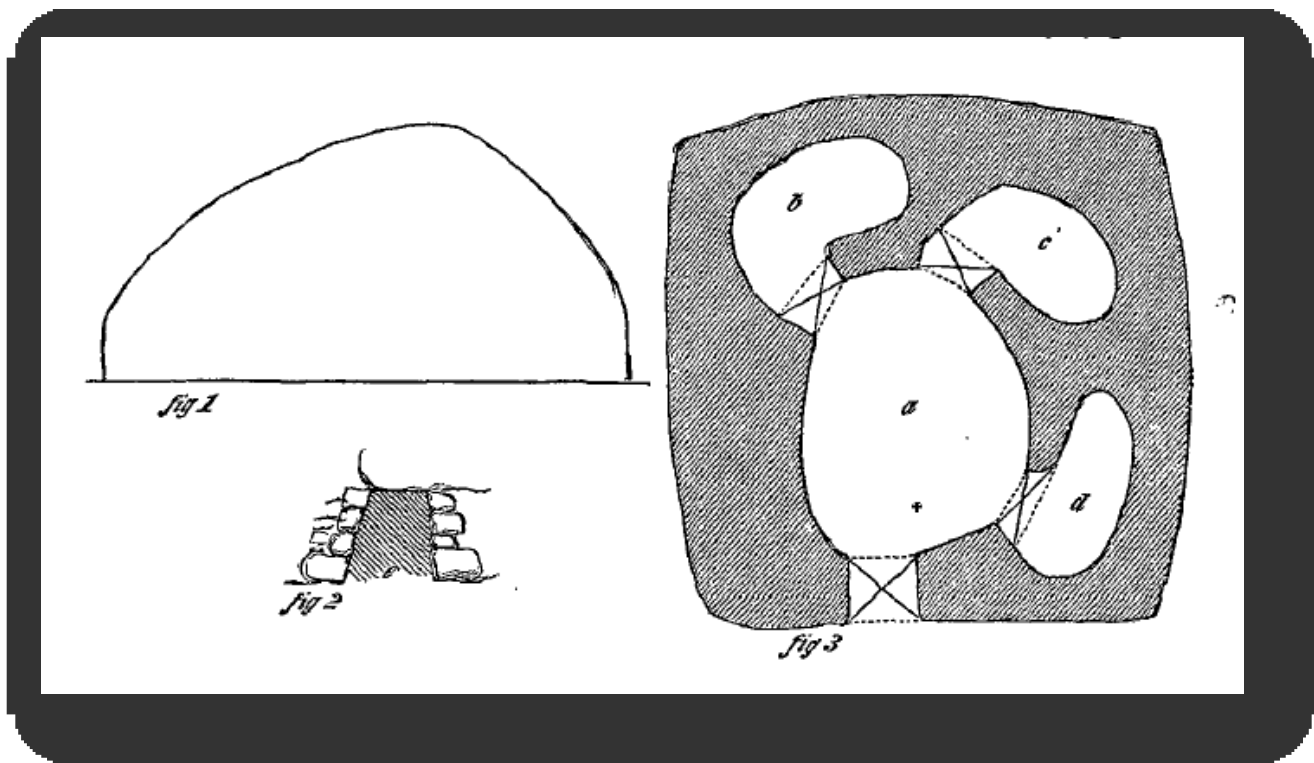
Sketch plan, section and detail elevation of the 'Amazon's House'. Muir and Thomas 1862, 227
